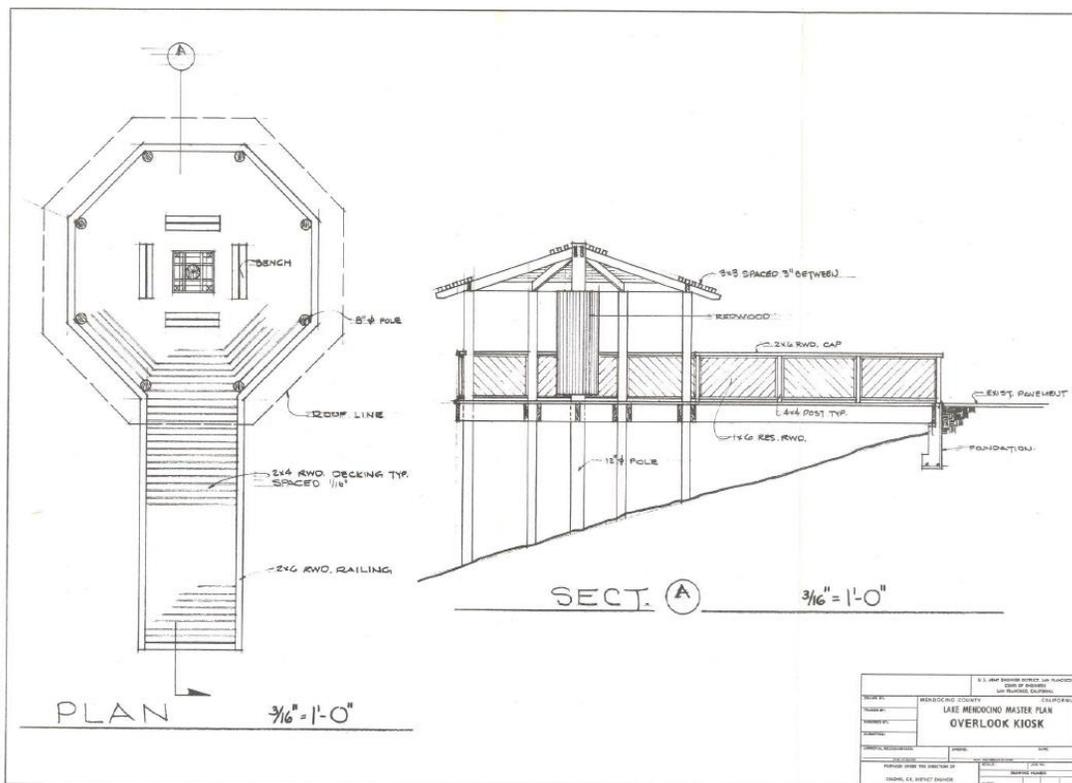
Site and building plan for overlook kiosk from original 1977 Master Plan.
